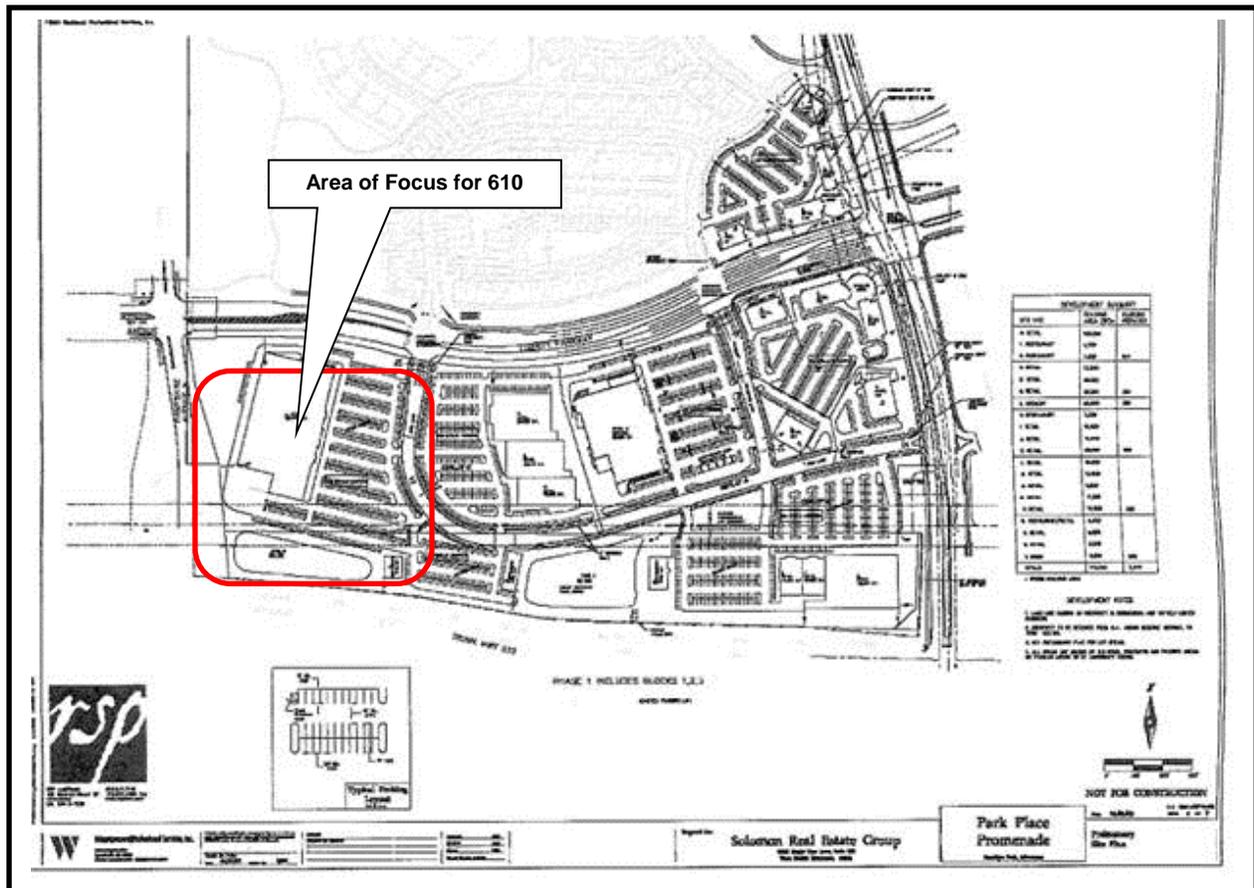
Former Park Place Promenade Site Layout (Source: Traffic Impact Study for Liberty Oaks Subdivision, Brooklyn Park, MN, Updated May 4, 2005, Westwood Professional Services, Inc.)
